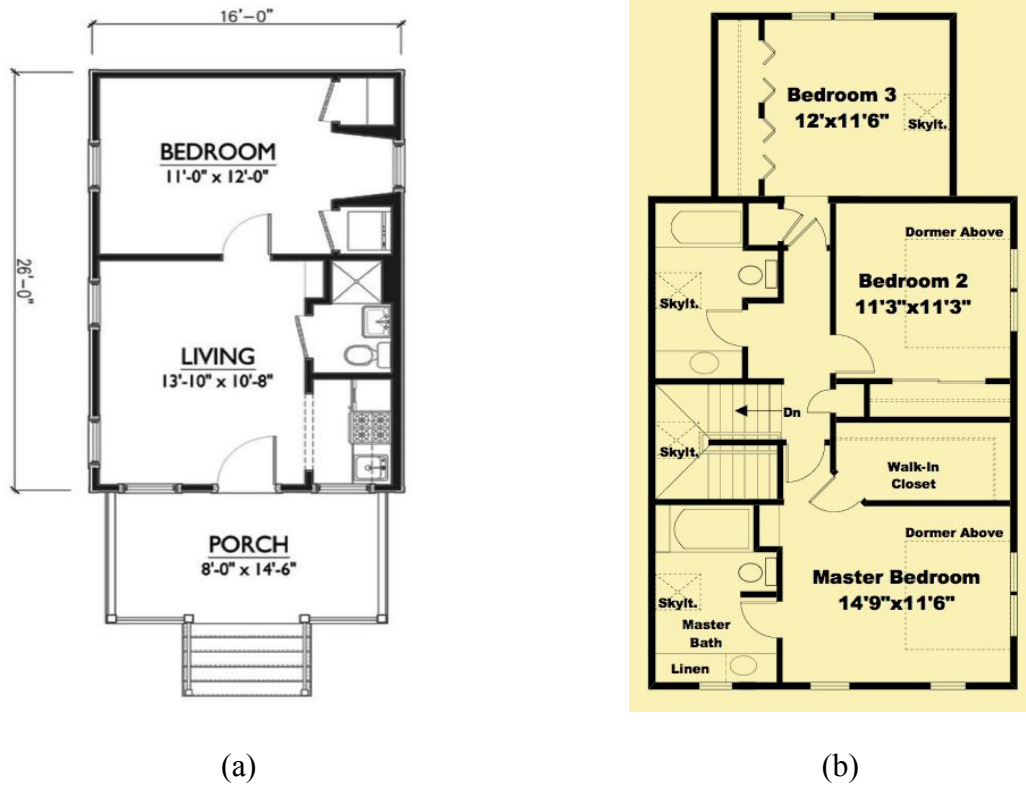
Floor plans from houseplans.com (a) and architecturalhouseplans.com (b)
